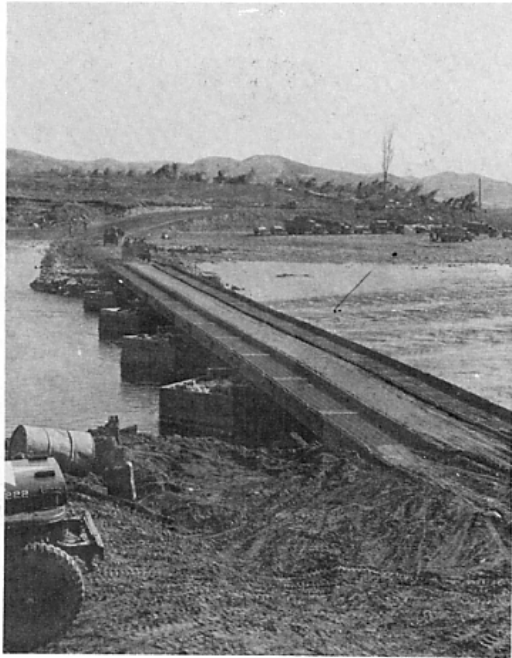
Construction of the Whitefront rock-filled crib-pier bridge in November 1951.
